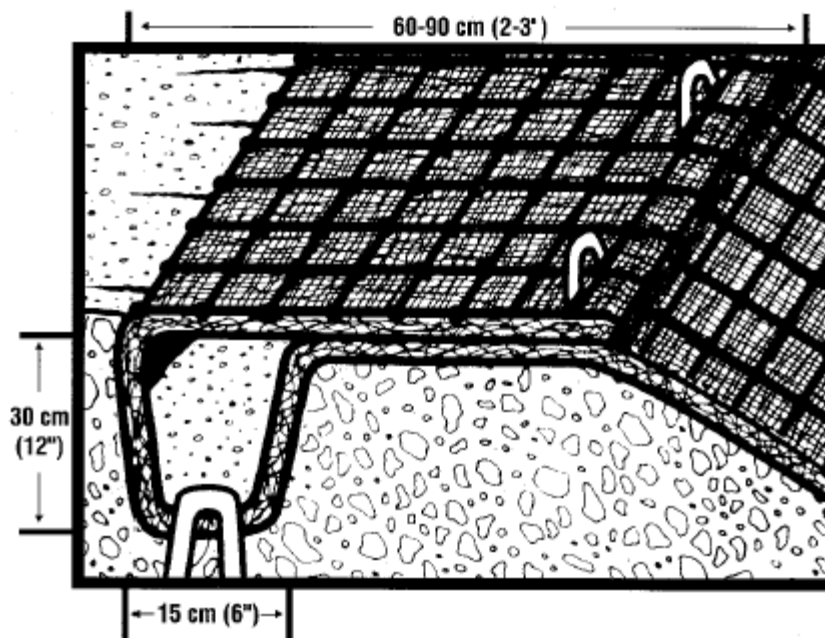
Initial Anchor Trench for Blankets/Matting
